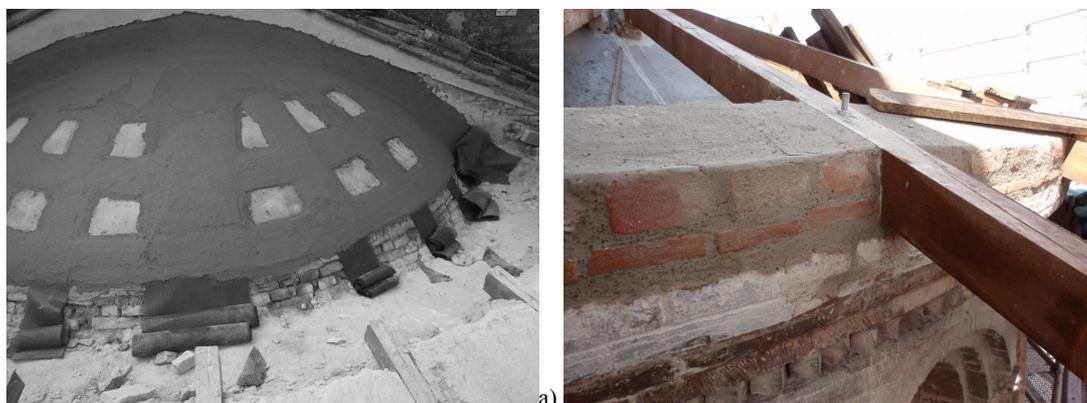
St. Bassiano church apse: a) FRCM matrix application and b) timber beams fixing
